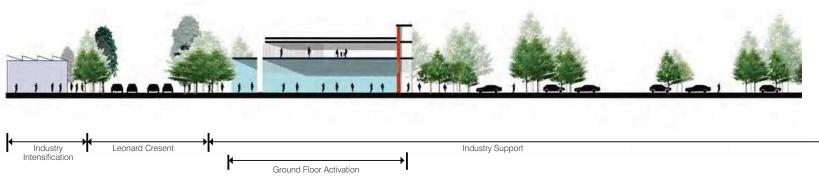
Brendale Transition Precinct Indicative Section
